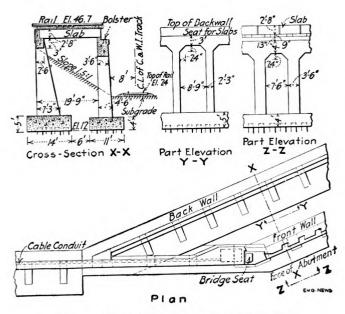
CONCRETE PIERS OF 79TH ST. BRIDGE (Note bolster for floor-beam seat)
